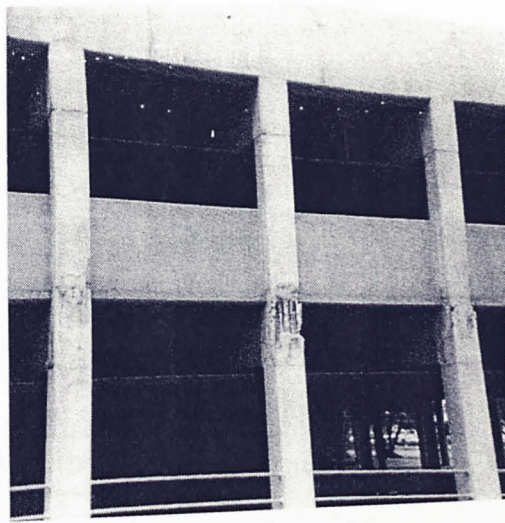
Initial stages of column joint degradation in the progressive failure of a fashion center parking structure in the Whittier Narrows earthquake, 1987.
